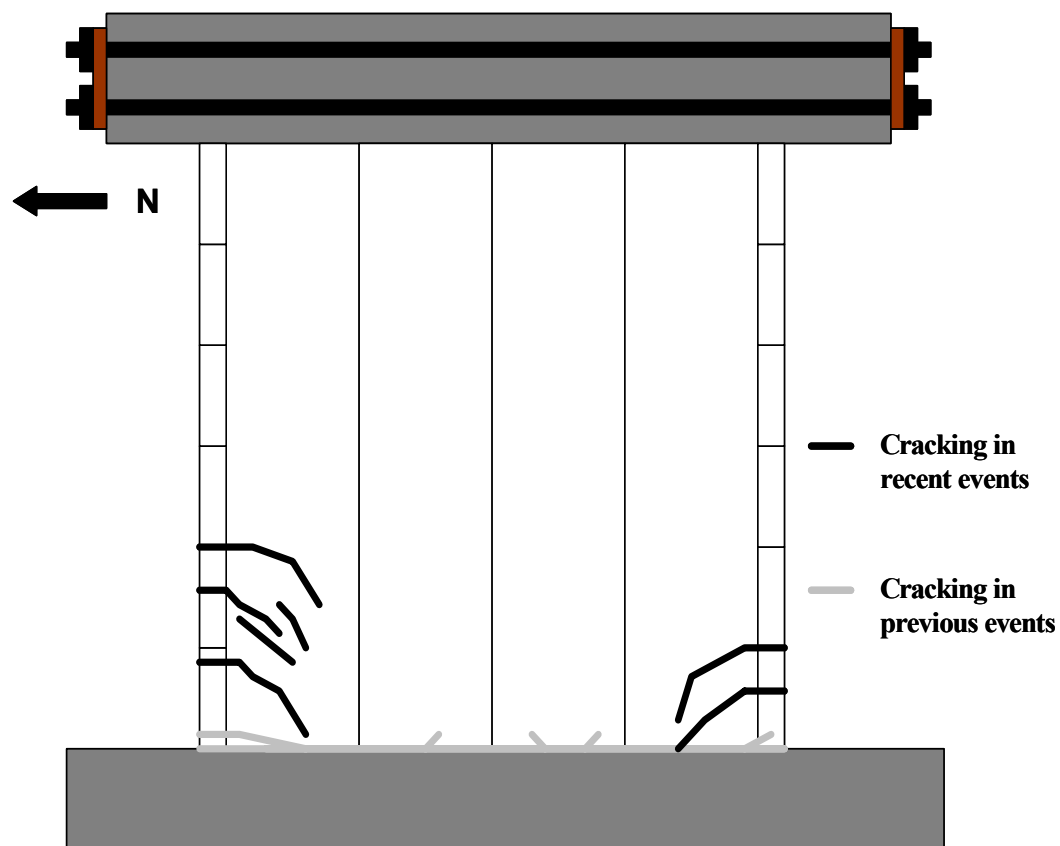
Flexure-shear cracks at north end of Shear Wall Specimen 17
